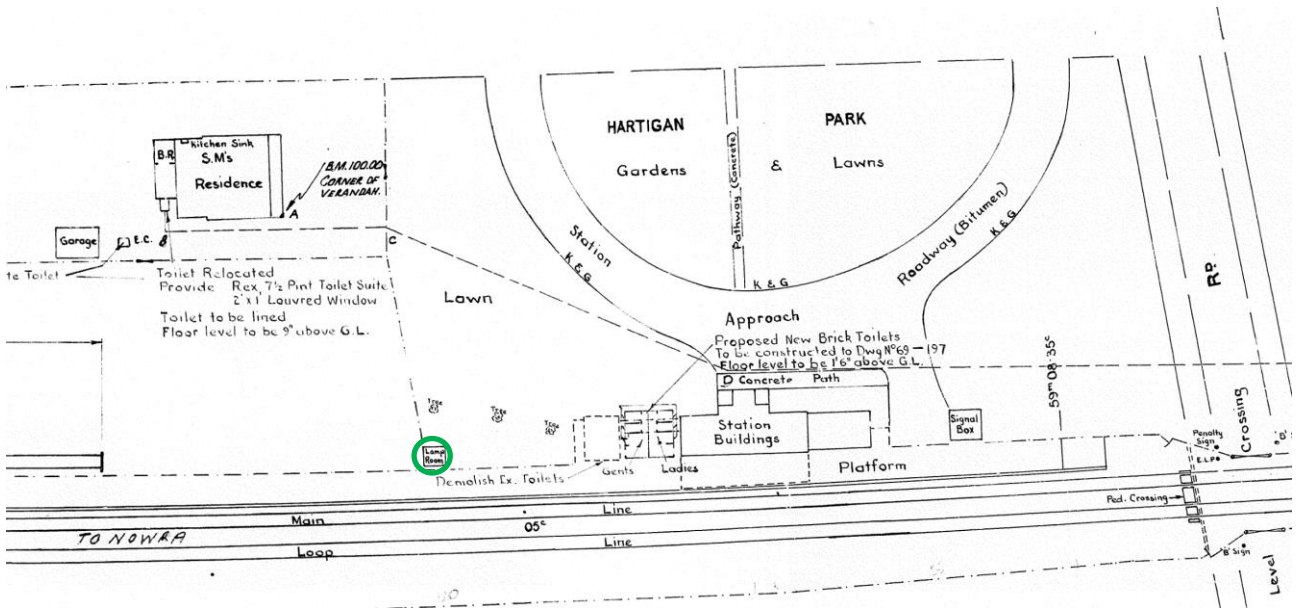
Excerpt from plan "NSWR Dapto Station Arrangements", 1971. Source: Sydney Trains plan EDMS CV0445049
